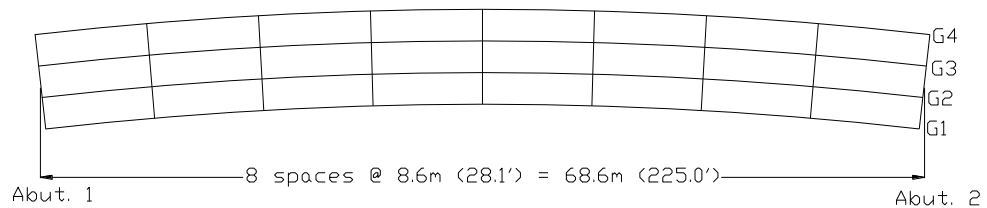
Stage 4 of Construction for Single Girder (Inner Girder Placed First) Erection of Single-Span, 4-Girder, 305-m (1000-ft) Radius Bridge.
